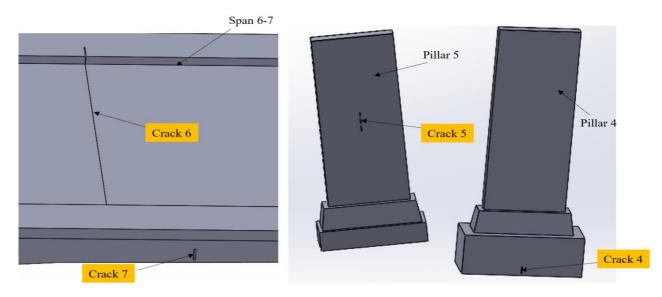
Locations of cracks 4,5,6 and 7on Herøysund bridge model
